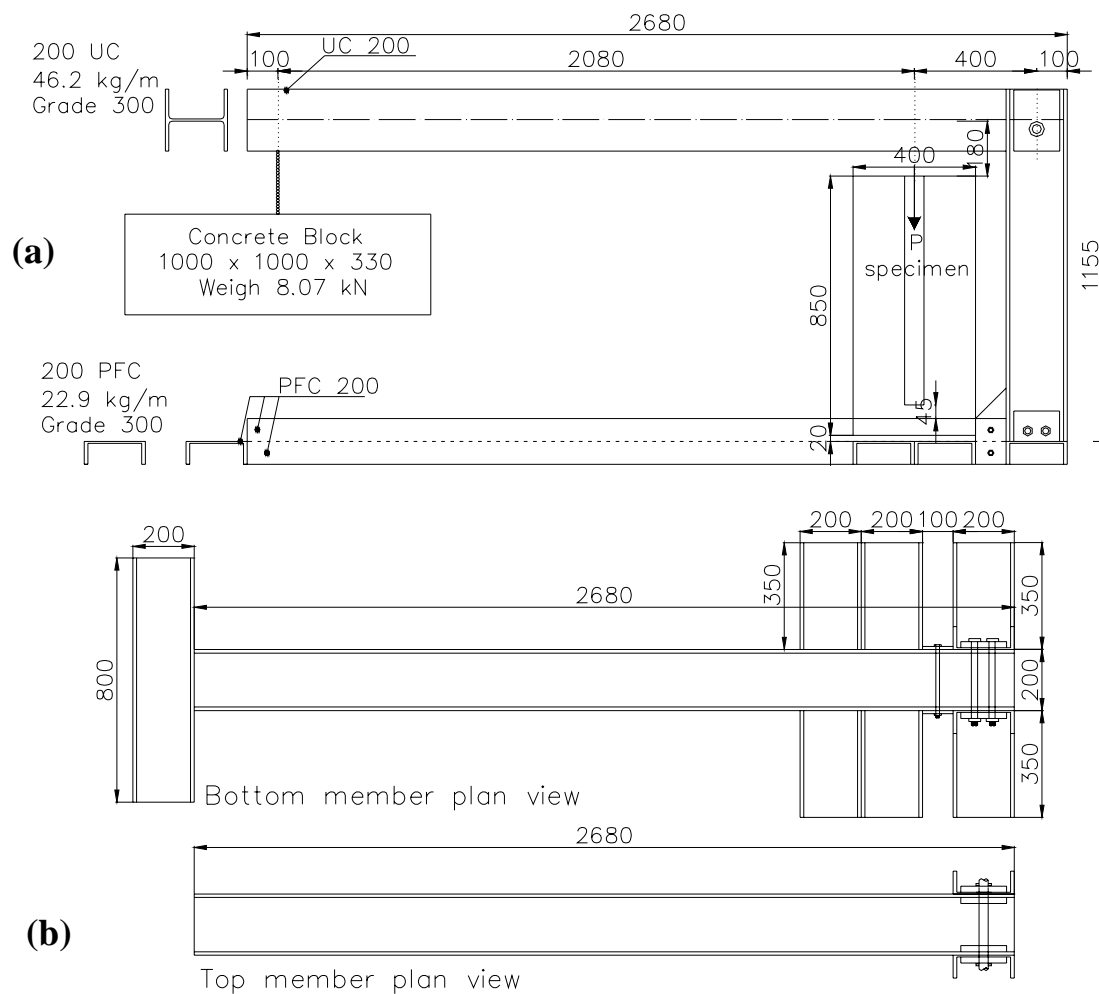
Frame 1 for triangular notched connection push-out specimen: (a) Side elevation; and (b) Bottom and top member plan view
